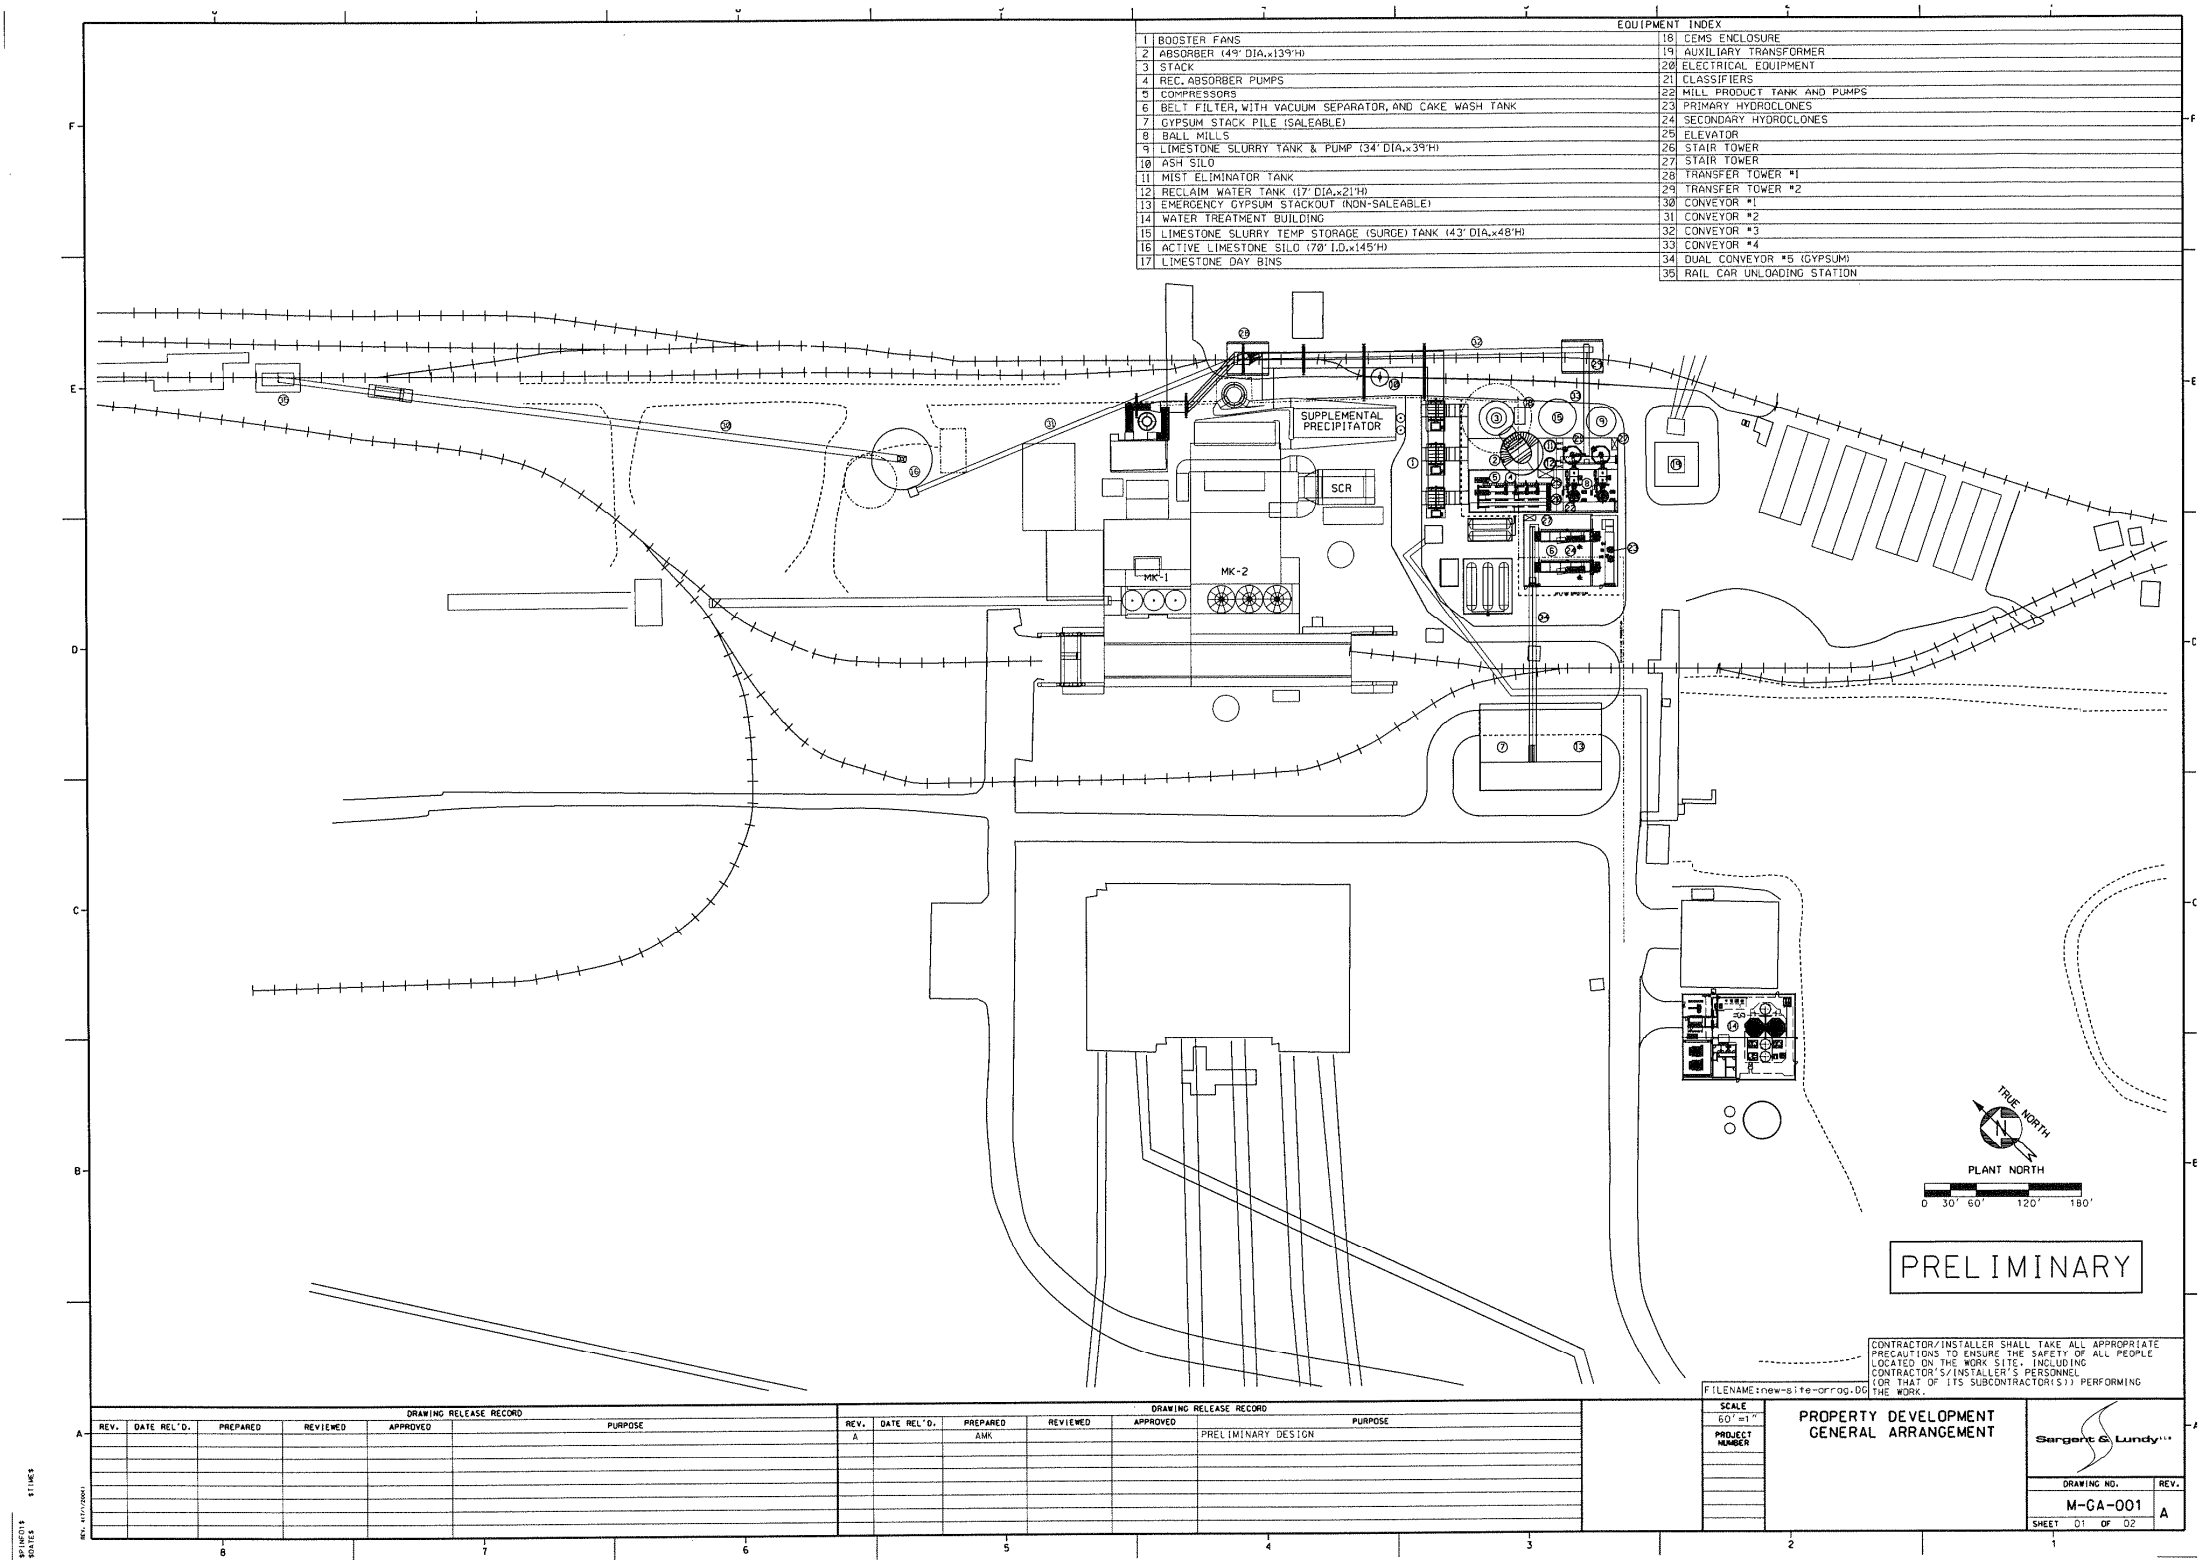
Figure F - Scrubber Drawings M-GA-001 Sheet 1
